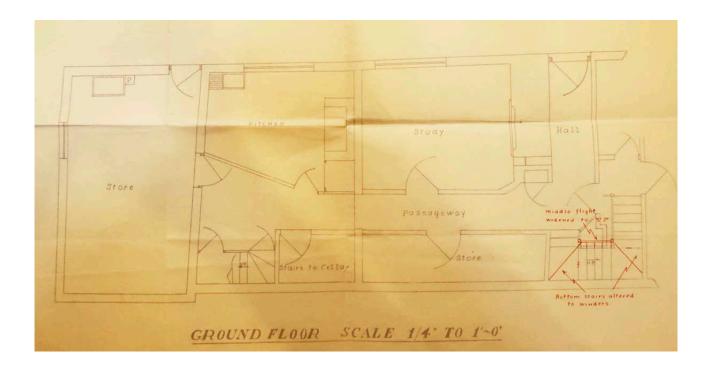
Partial ground-floor plan of 10 Church Street; the shop on the street front is not shown. North is approximately to the right. [Private collection; reproduced with permission]
